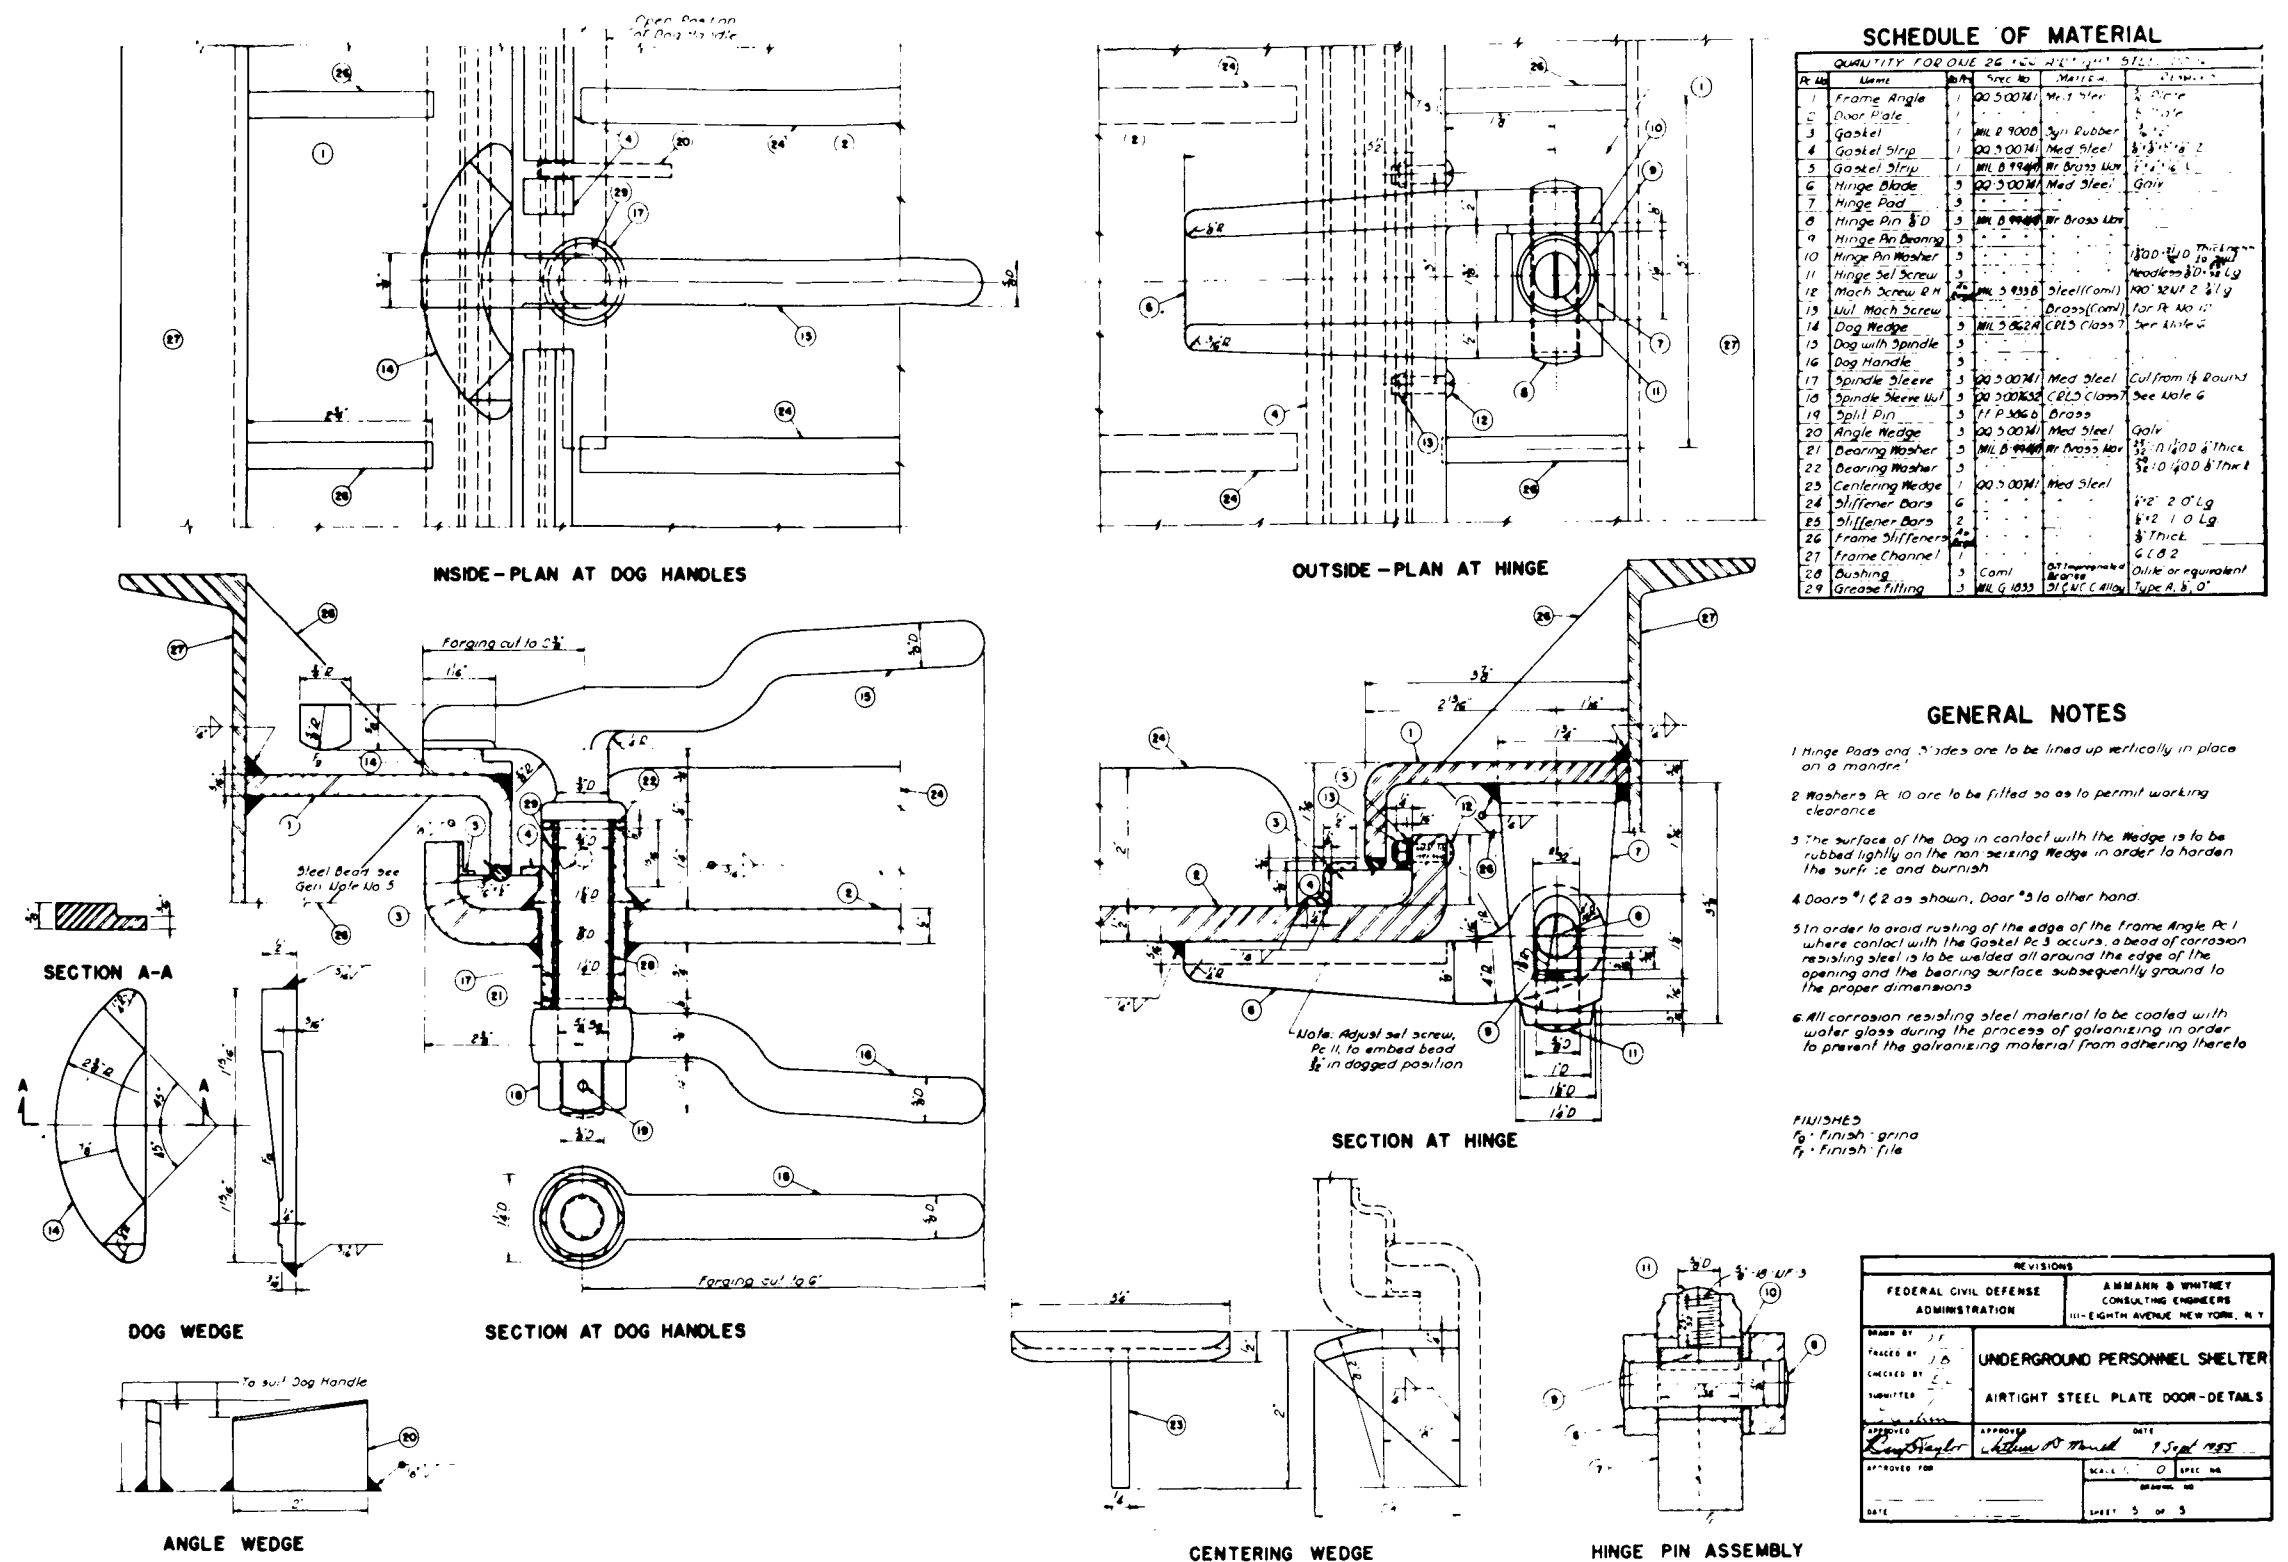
Airtight steel-plate door details, underground personnel shelter.
